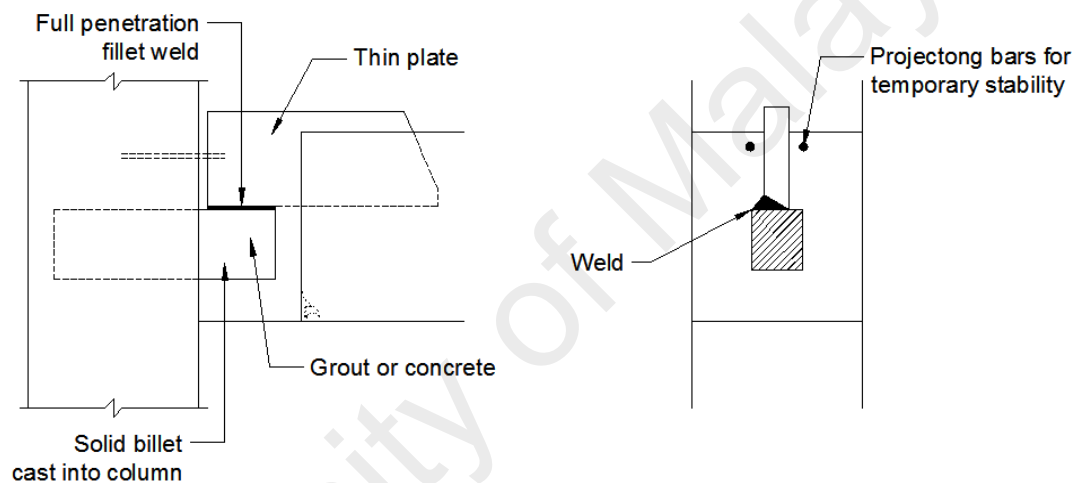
Precast beam to column connection using solid billet with welded plate in beam (Elliott, 1996)
